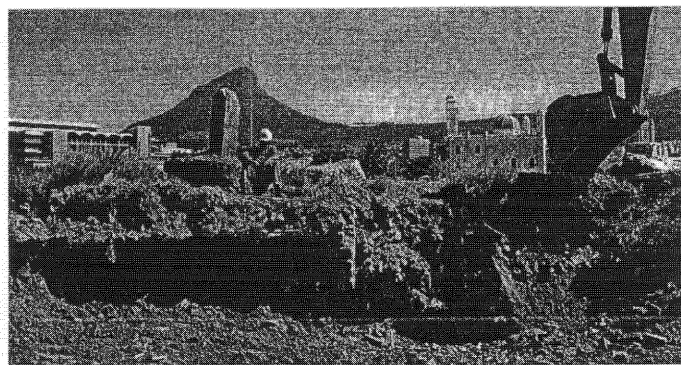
End wall of demolished building, drain shaft, rubble. [AM 04/03 Strip 3 Section 6]
